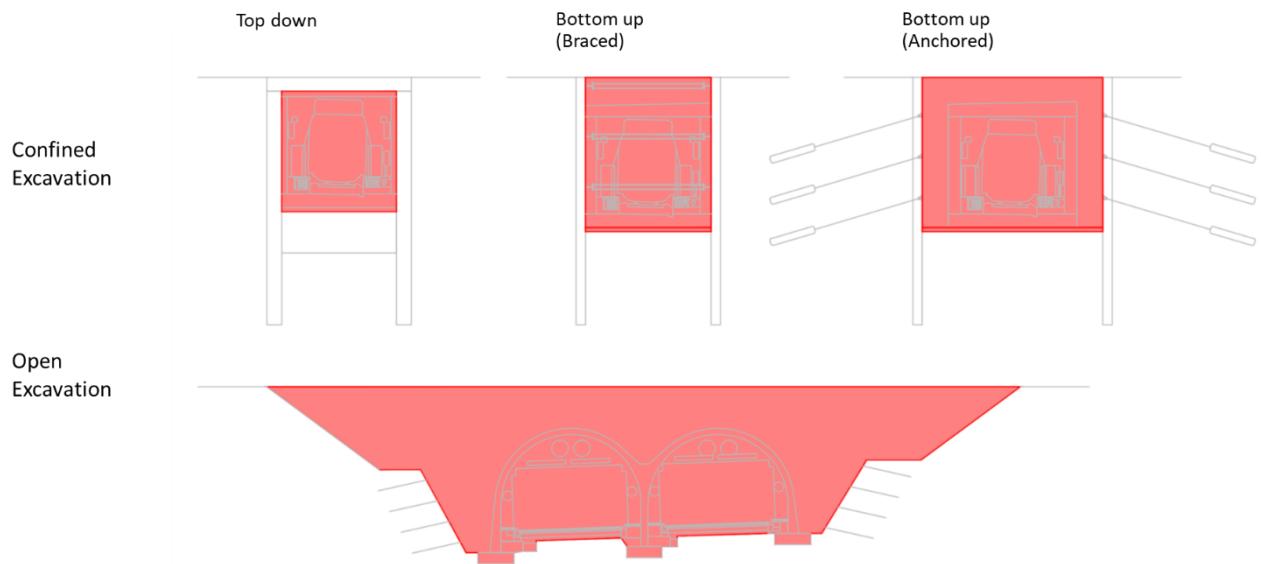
Typical excavation geometries of cut and cover tunnelling (source SBB/ILF)
